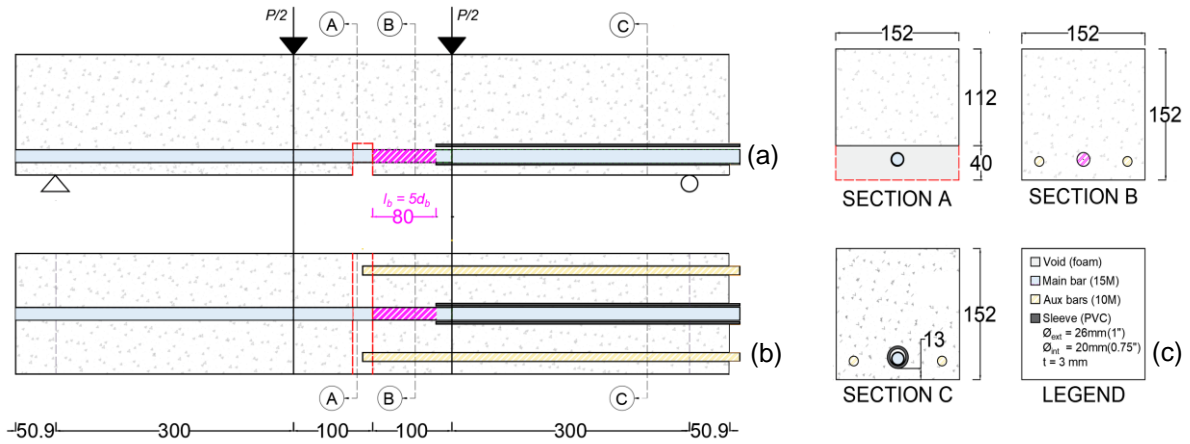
Specimen detailing: (a) front view, (b) top view and (c) cross-sections (all dimensions in mm)
